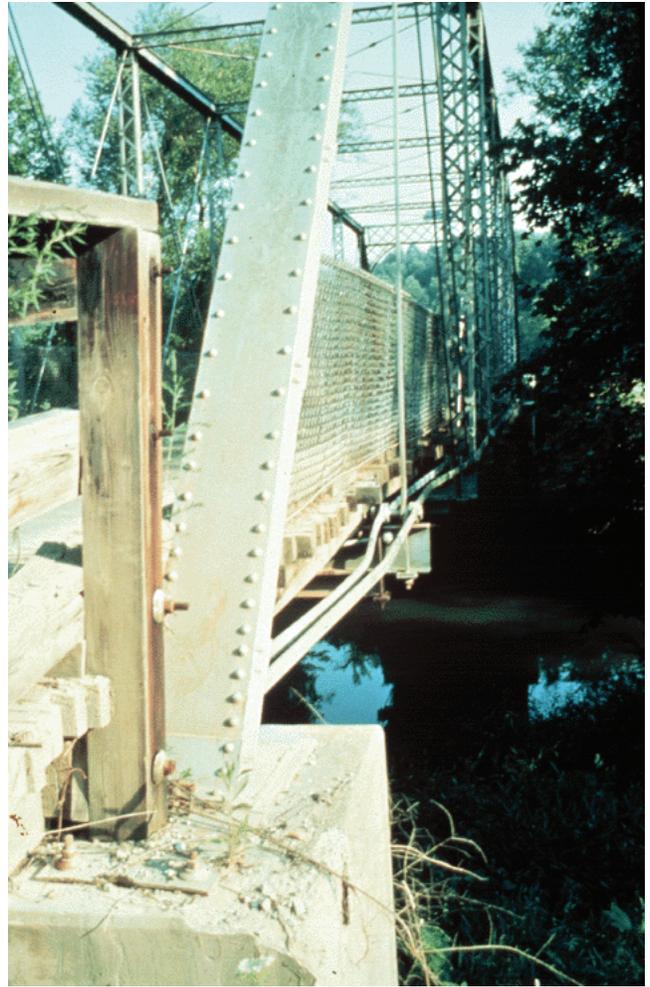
Buckled Eyebar due to Abutment Movement
